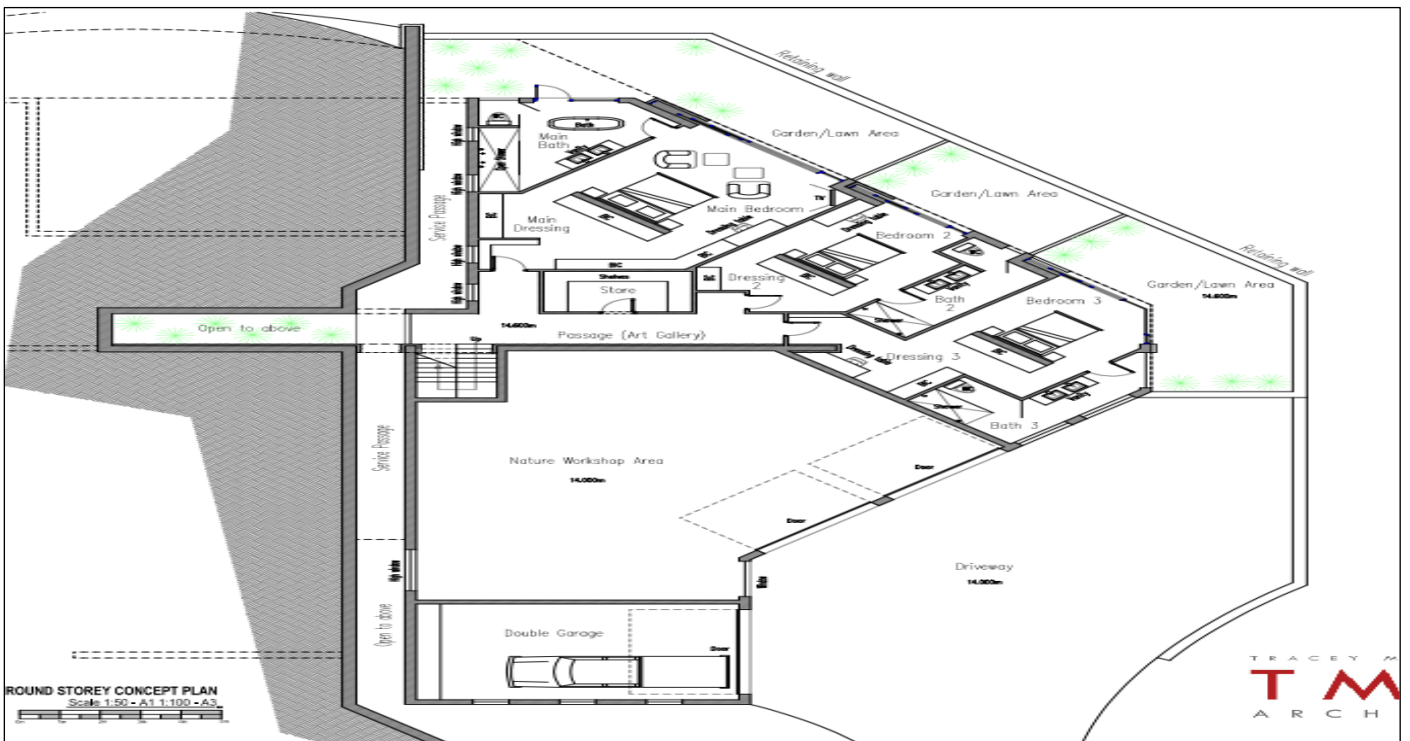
Concept Plan for the ground floor of the proposed conference centre and tourist facilities (TMBA, 2023)
